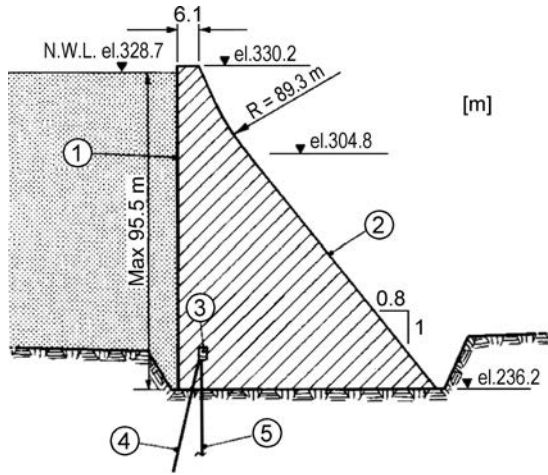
Cross-section of the Olivenhain dam (after Dunstan, 2002). (1) Exposed geomembrane liner; (2) downstream face; (3) foundation gallery; (4) grout curtain; (5) foundation drain.
